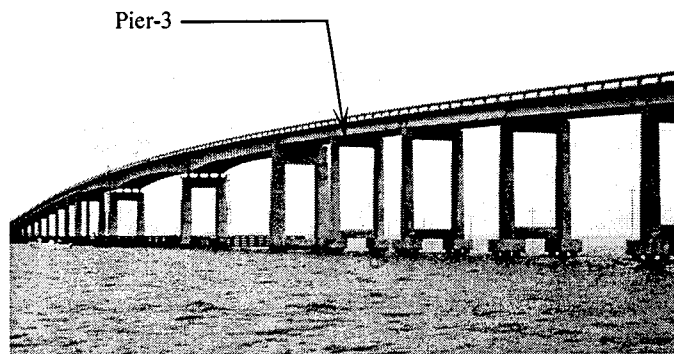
Pier-3 in relation to entire bridge structure (view looking North)
